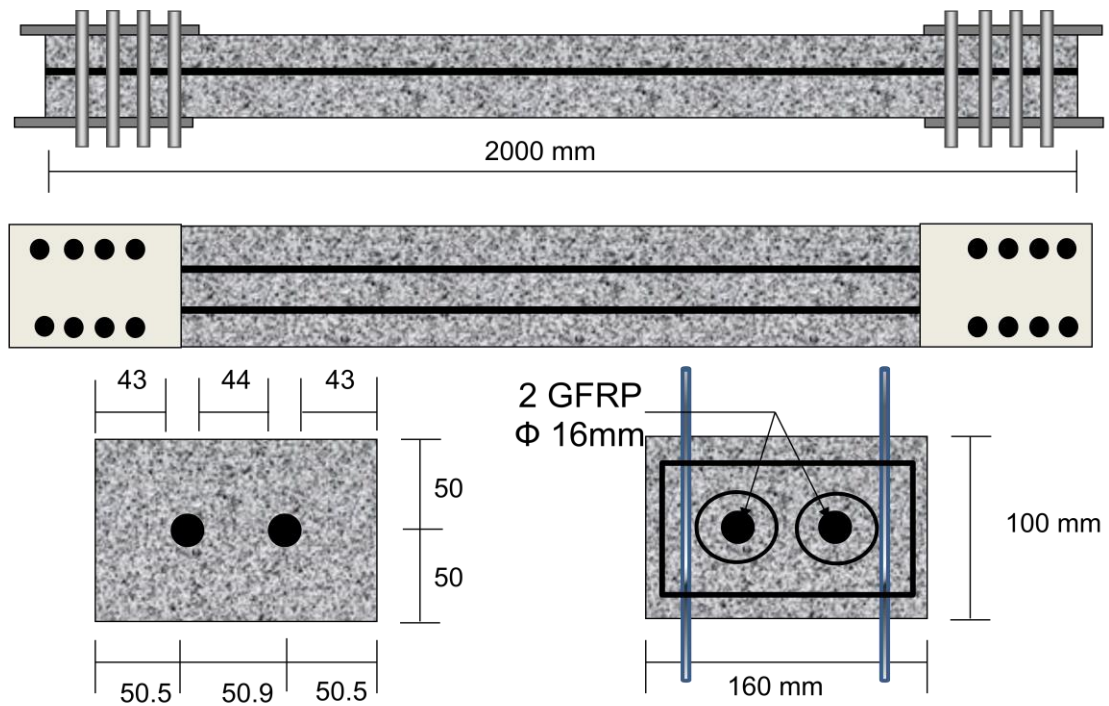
Detailing of the GFRP prestressed concrete straps.
